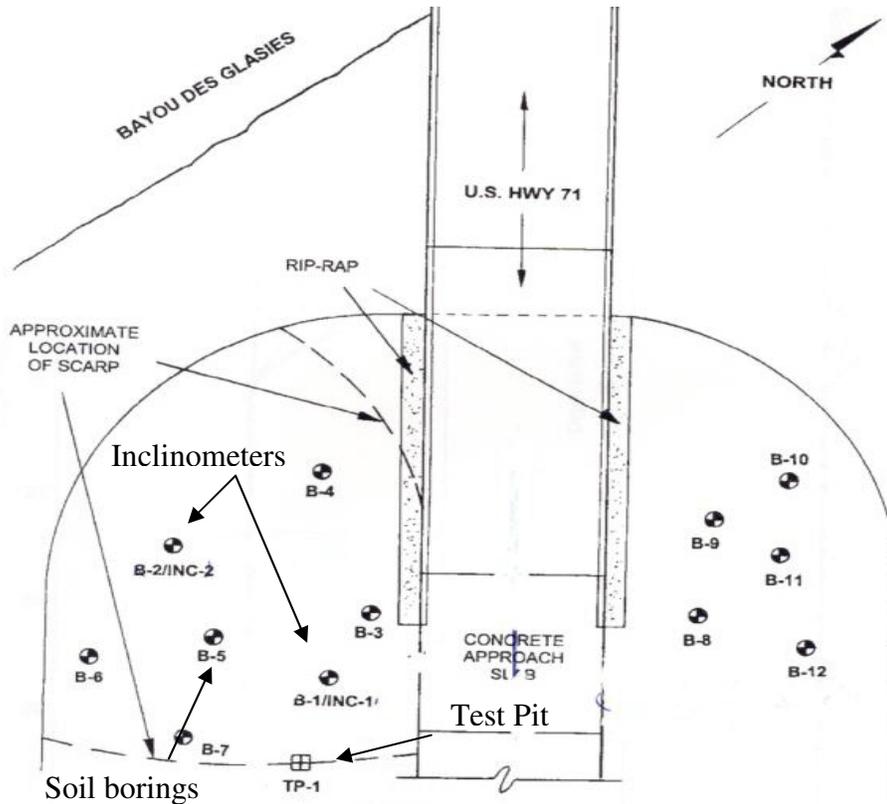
Plan View of Slope Failure and Boring Location/Instrumentation Plan
